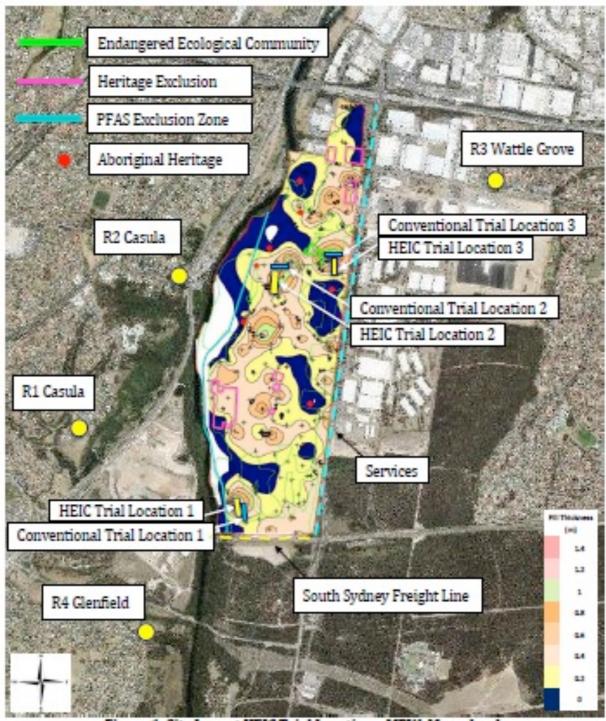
Site Layout HEIC Trial Locations, MPW, Moorebank.
